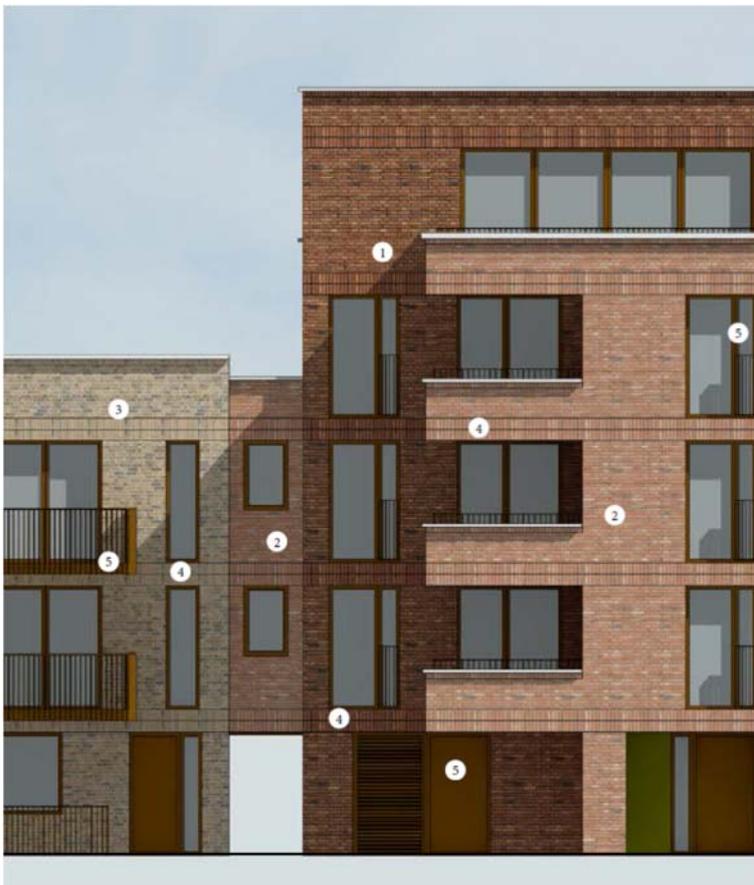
Front elevation with suggested materials for Site A. Please note this is a working draft
